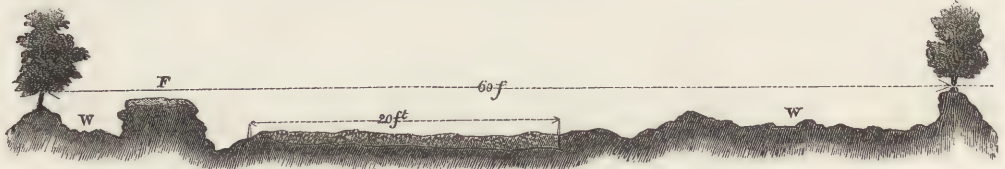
CROSS SECTION OF AN UNIMPROVED OLD ROAD.
